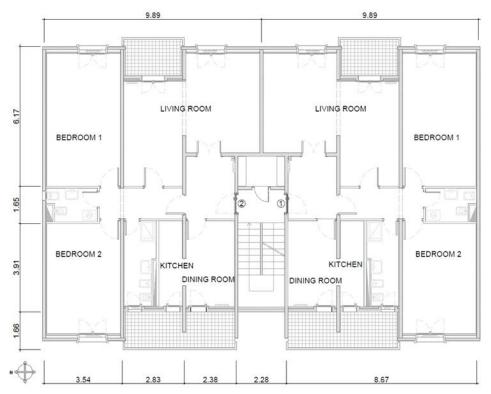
Small multi-family house – orientation and geometry of a typical apartment
